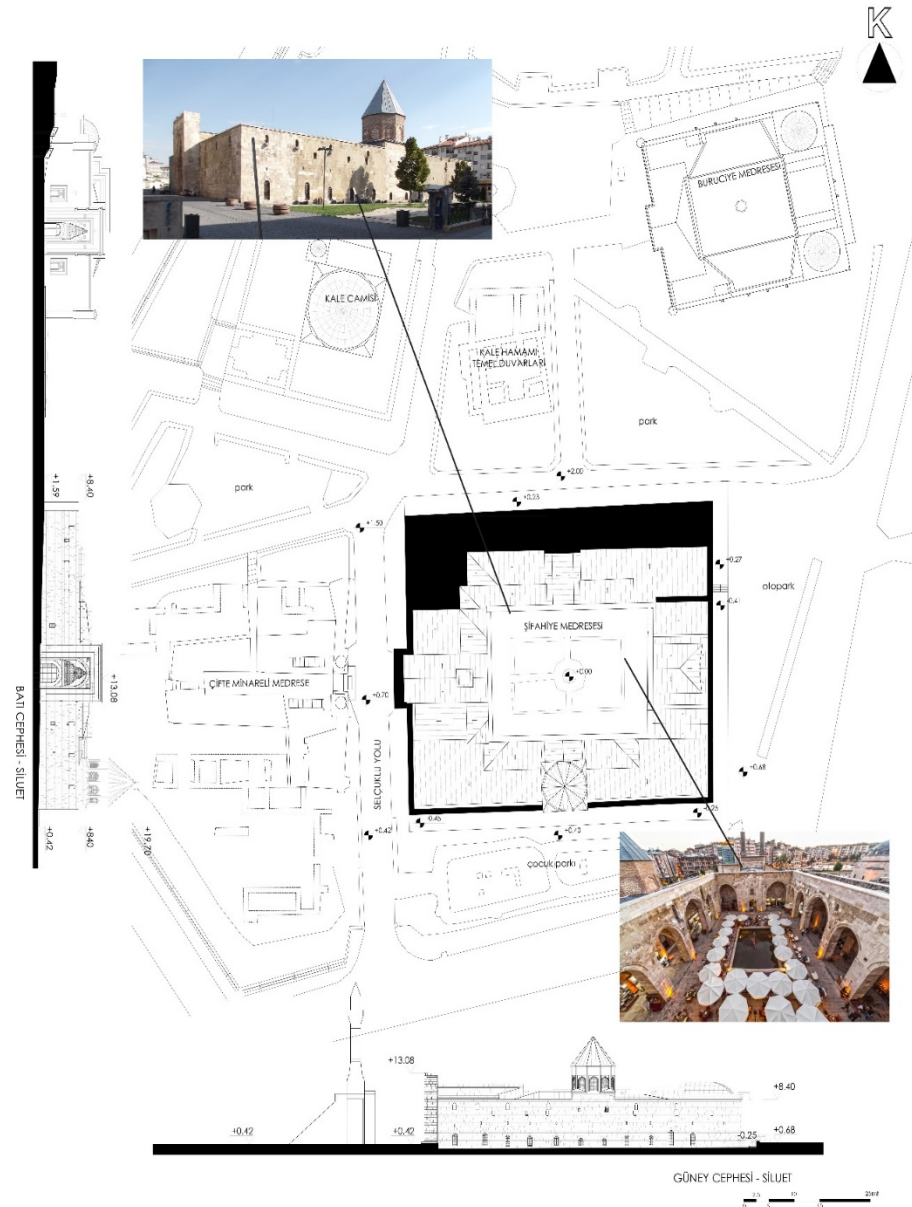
Şifaiye Madrasa Situation Plan and silhouettes (T. R. Directorate General of Foundations (VGM) archive was used)
